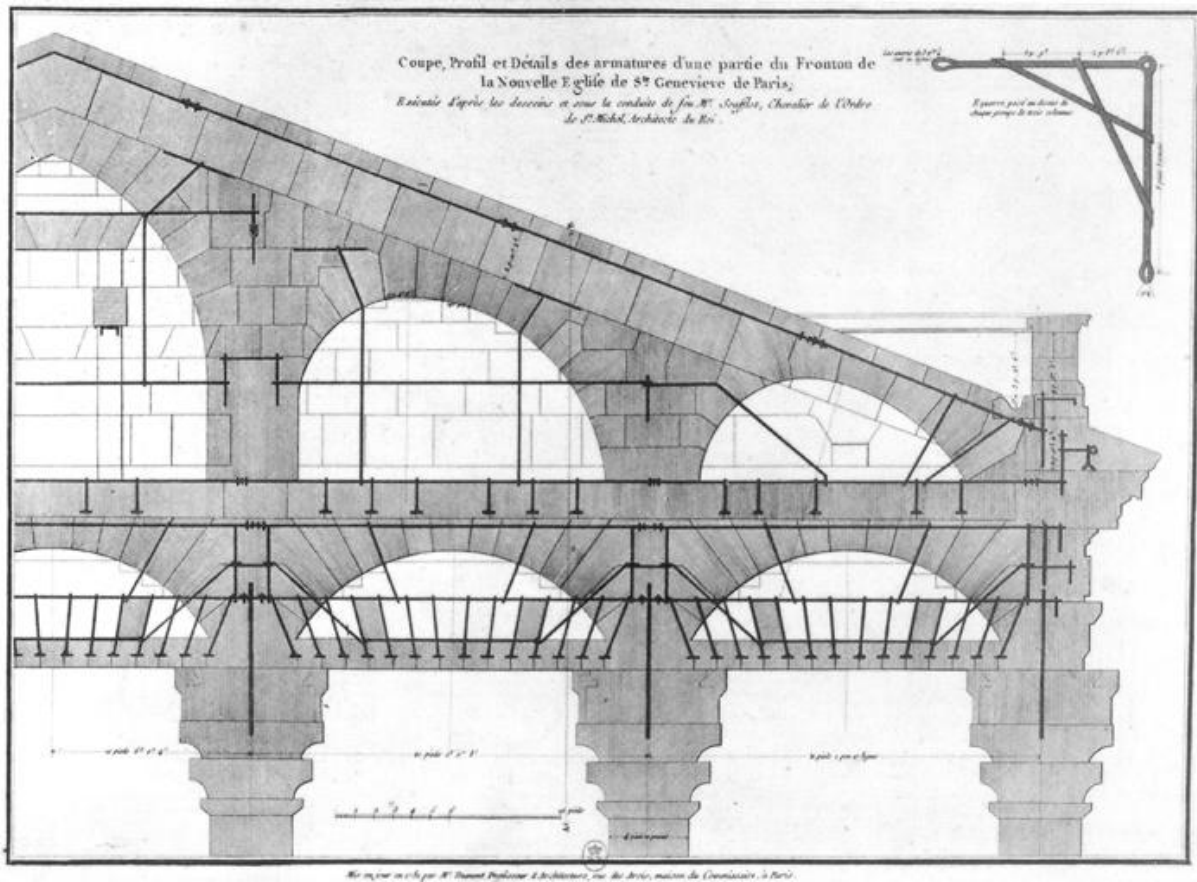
The drawing depicting the iron clamps in the flat arches clearly recalls reinforced concrete trusses
